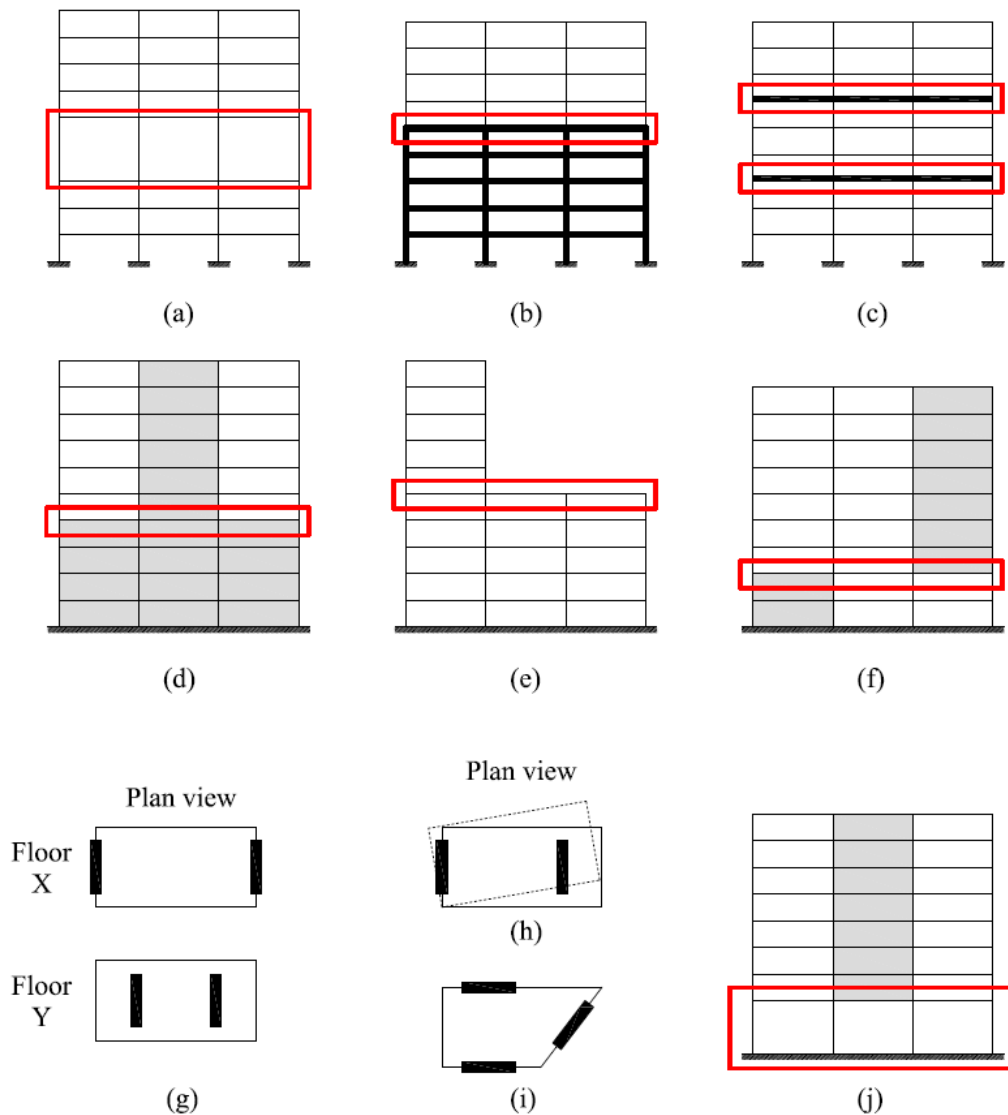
Common structural irregularities; (a) slender columns, (b) sudden vertical stiffness change, (c) undistributed mass, (d) wall configuration in elevation, (e) frame configuration in elevation, (f) in-plane discontinuity, (g) vertical member offsets, (h) torsional sensitivity, (i) non-orthogonal systems and (j) soft-story mechanism [adapted from Anderson and Brzev, 2009].
